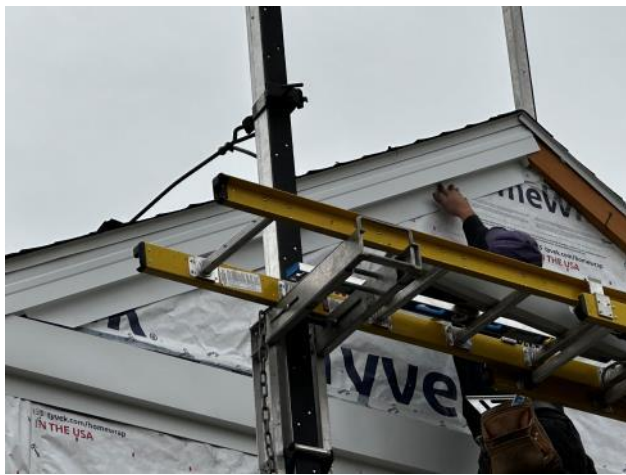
Overview of new aluminum wrap being installed at a rake board.
